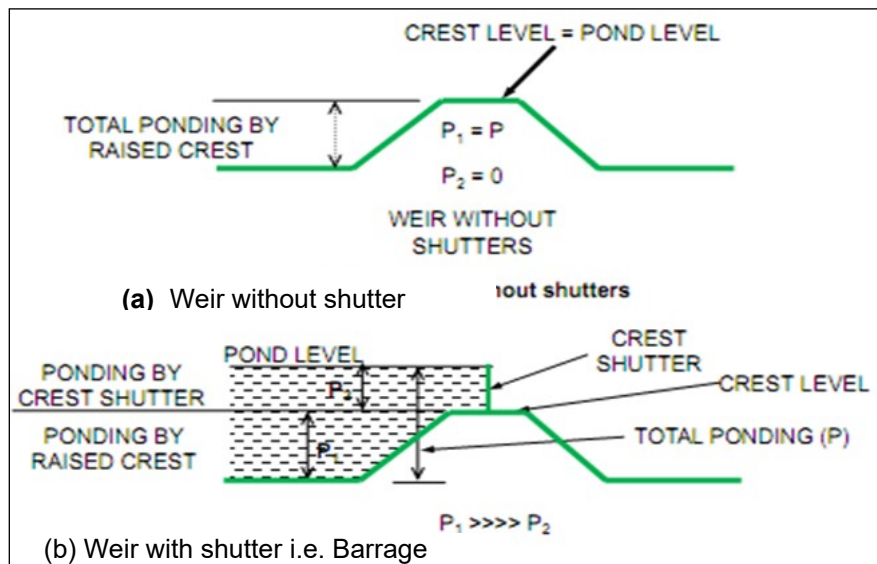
Schematic view of cross section through weir (a) and barrage (b)
